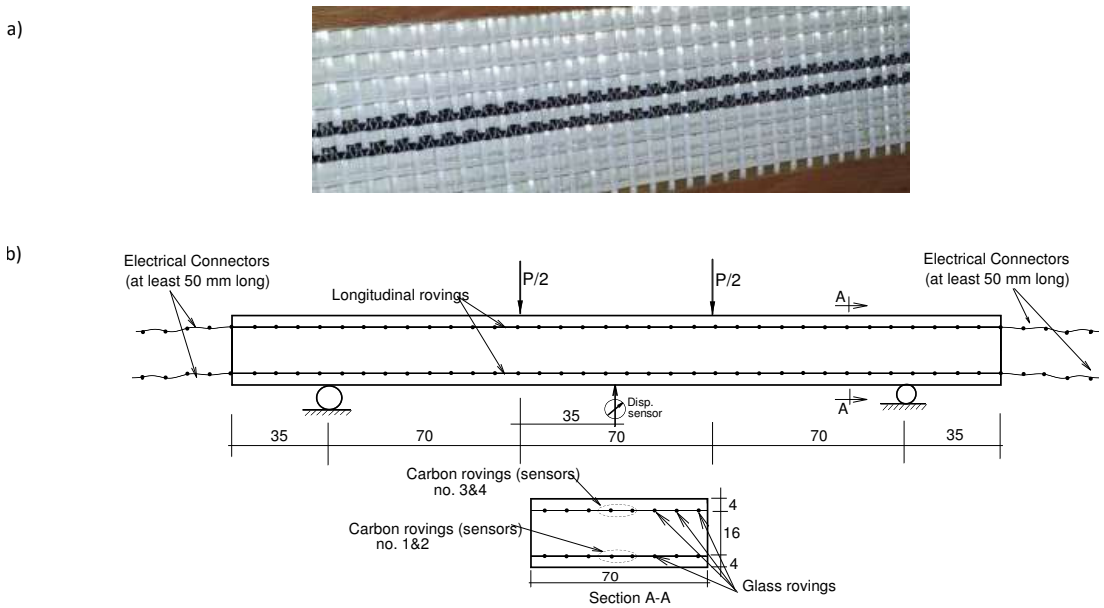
(a) The reinforcement sensory textile; (b) schematic drawing, cross section, geometrical parameters and loading scheme of the TRC specimen (dimensions in mm) [Goldfeld et al. 2016a].
